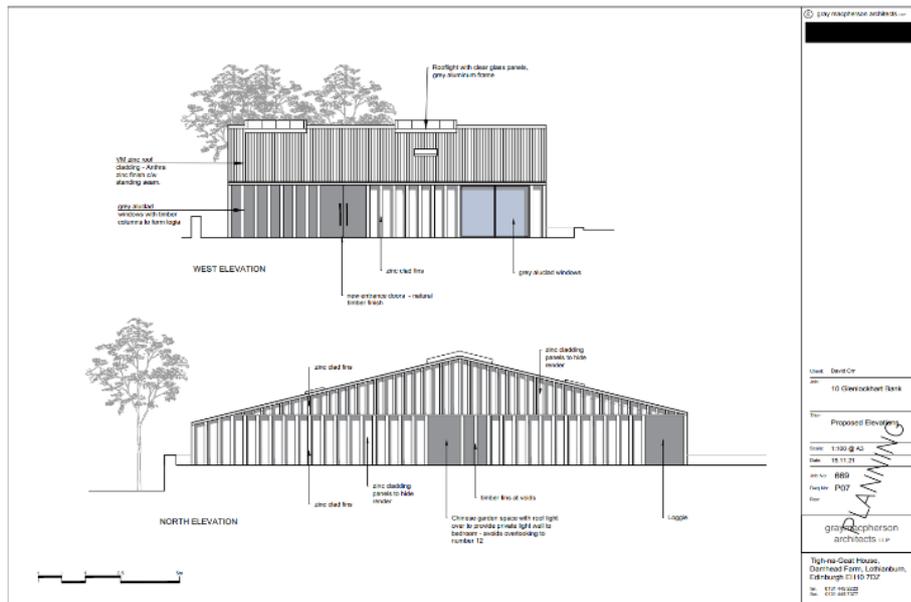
Proposed West (facing No 10) and North Elevation (facing No 12)
